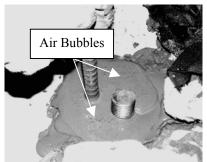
shows tremie-tube grouting for CBC. To fill the connection voids and limit air entrapment within the connection, the tube was lowered to the bottom of one duct and grout was poured from 5-gallon buckets *continuously* until the grout level rose in all the ducts. The two vent tubes were sealed when grout streamed out in a steady flow without air. When the grout level rose within approximately 3 in. of the surface, the tube was removed. The ducts were then topped off from above, as shown in Figure 4.21a. Each duct was tamped with a rod two times during grouting. During grouting of the CVD specimen, air quickly rose to the surface. Hence, little air removal was observed during tamping. However, as shown in Figure 4.21b, the thicker CBC grout exhibited significant air removal both during and after tamping. The 30-minute working time provided a comfortable amount of time for grouting operations.
